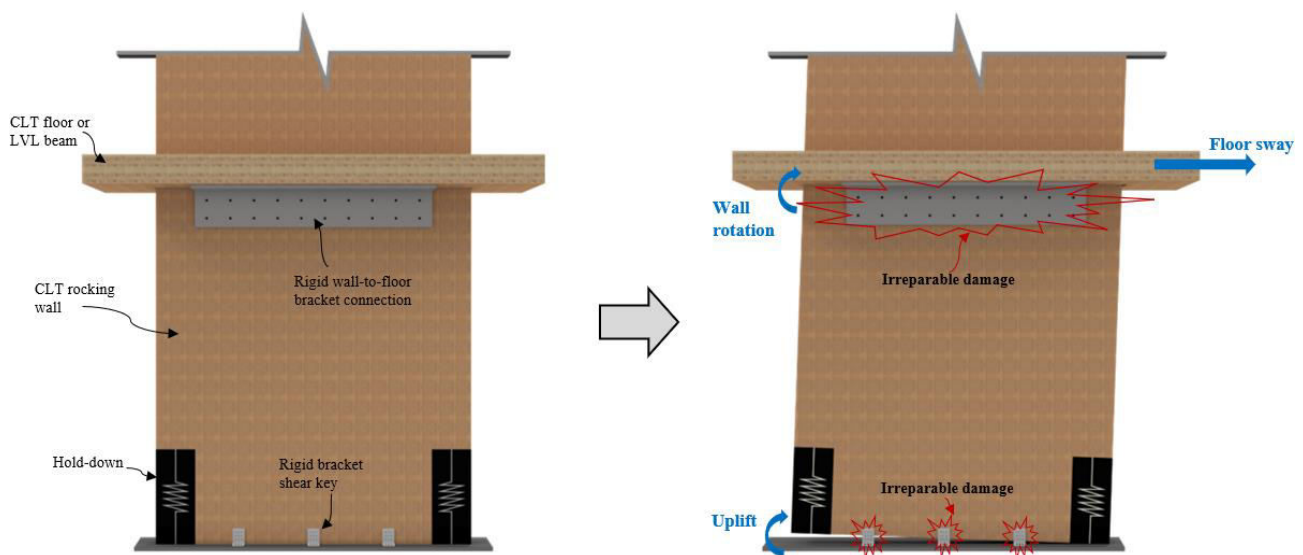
Rocking wall motion and its interaction with the floor and the rigid connection, leading to irreversible and irreparable damage.
